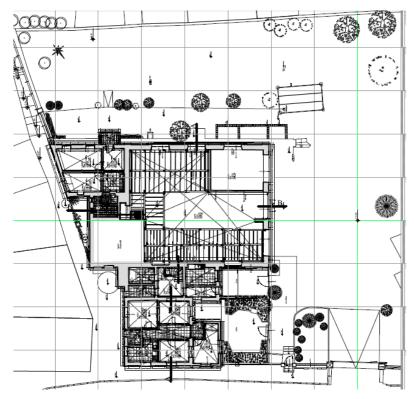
2. Feriköy Water Pump Station Plan (Şanlı, 2008)
